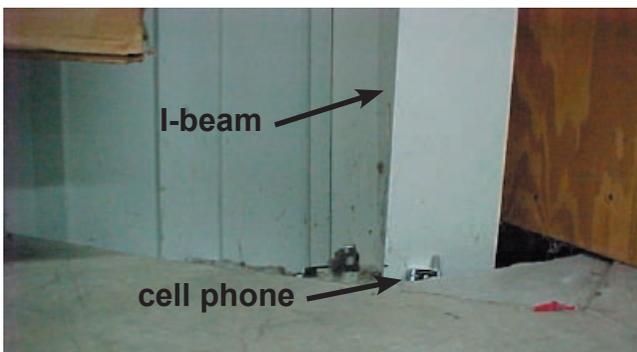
Heaved floor adjacent to load-bearing wall on main floor of the Carhartt factory. Note the top of a cell phone near the I-beam, which shows that the main floor was heaved upward about 4 in.
